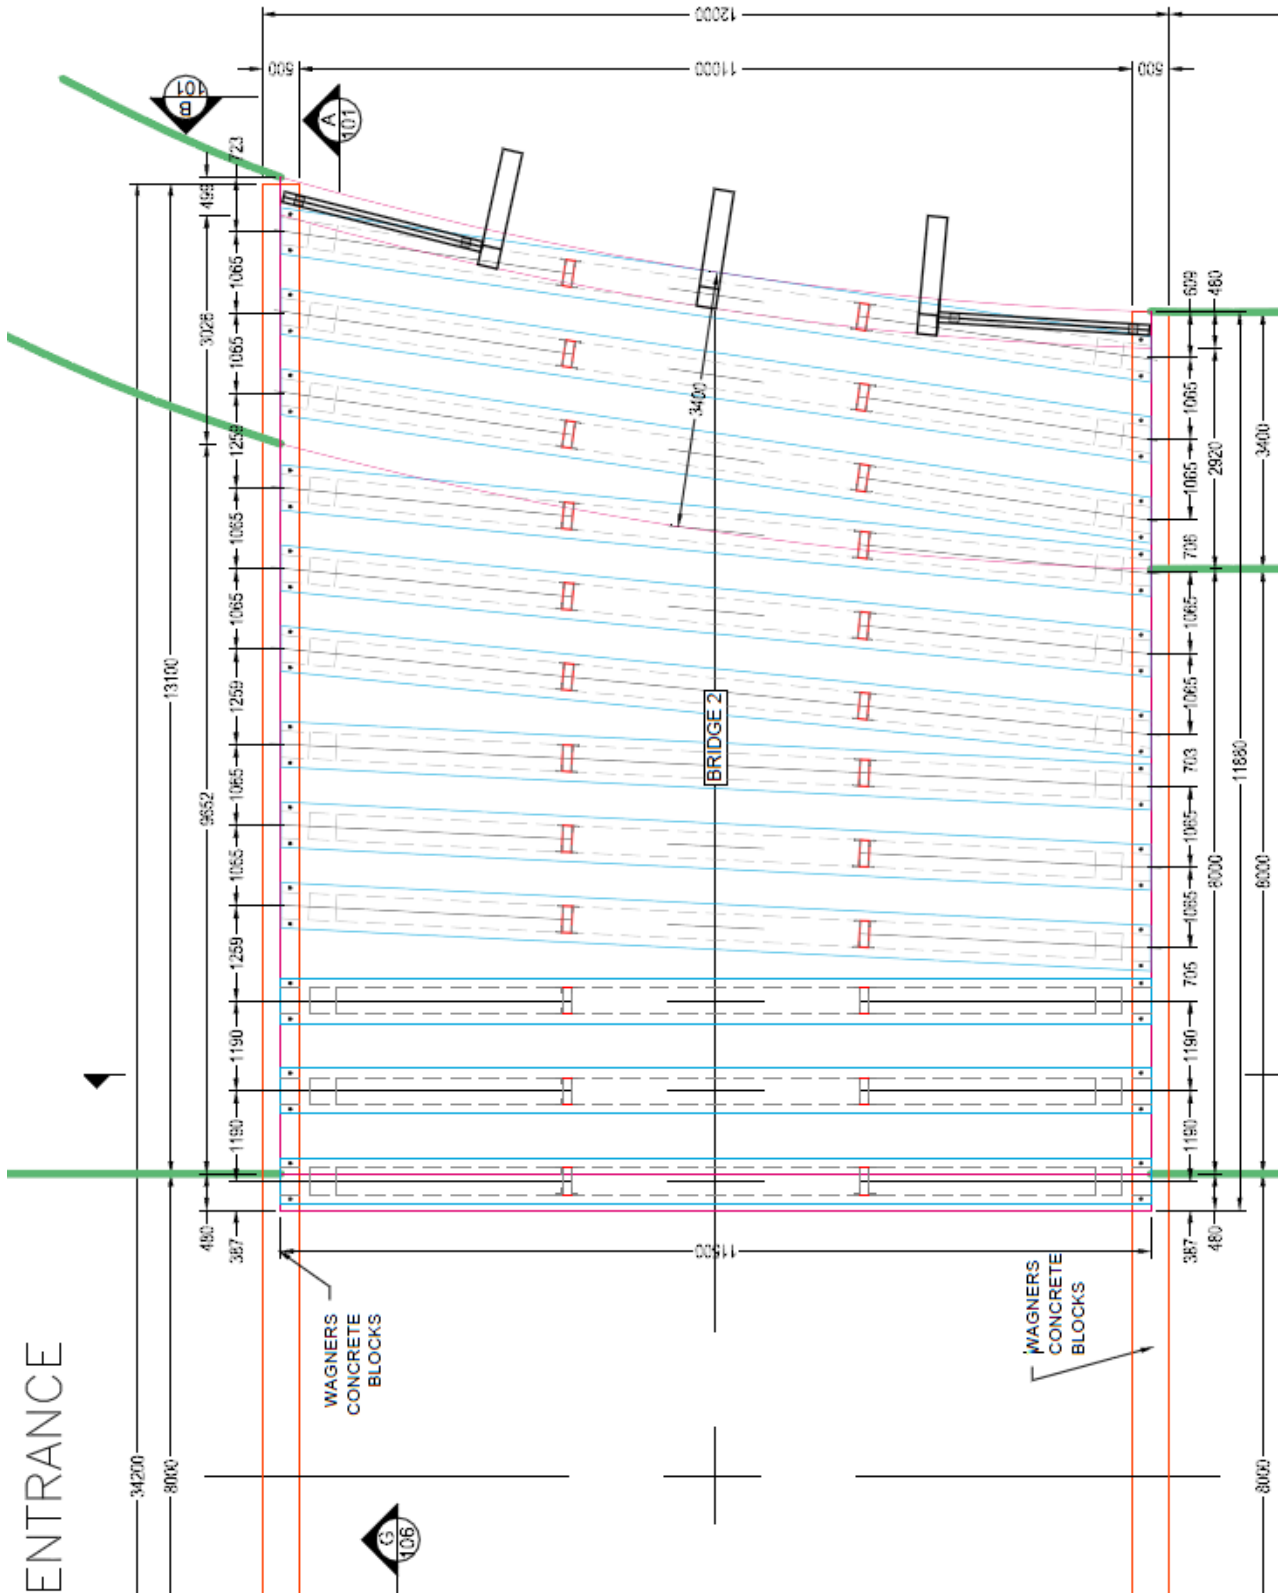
Top View of West Side of Symmetrical Bridge Showing Dimensions (i3 Consulting Pty Ltd).
